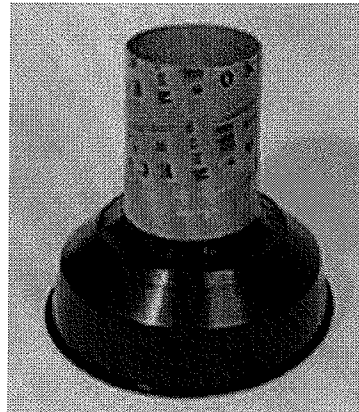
Redibase Construction Tube Footing Form with Pier Form Installed.
